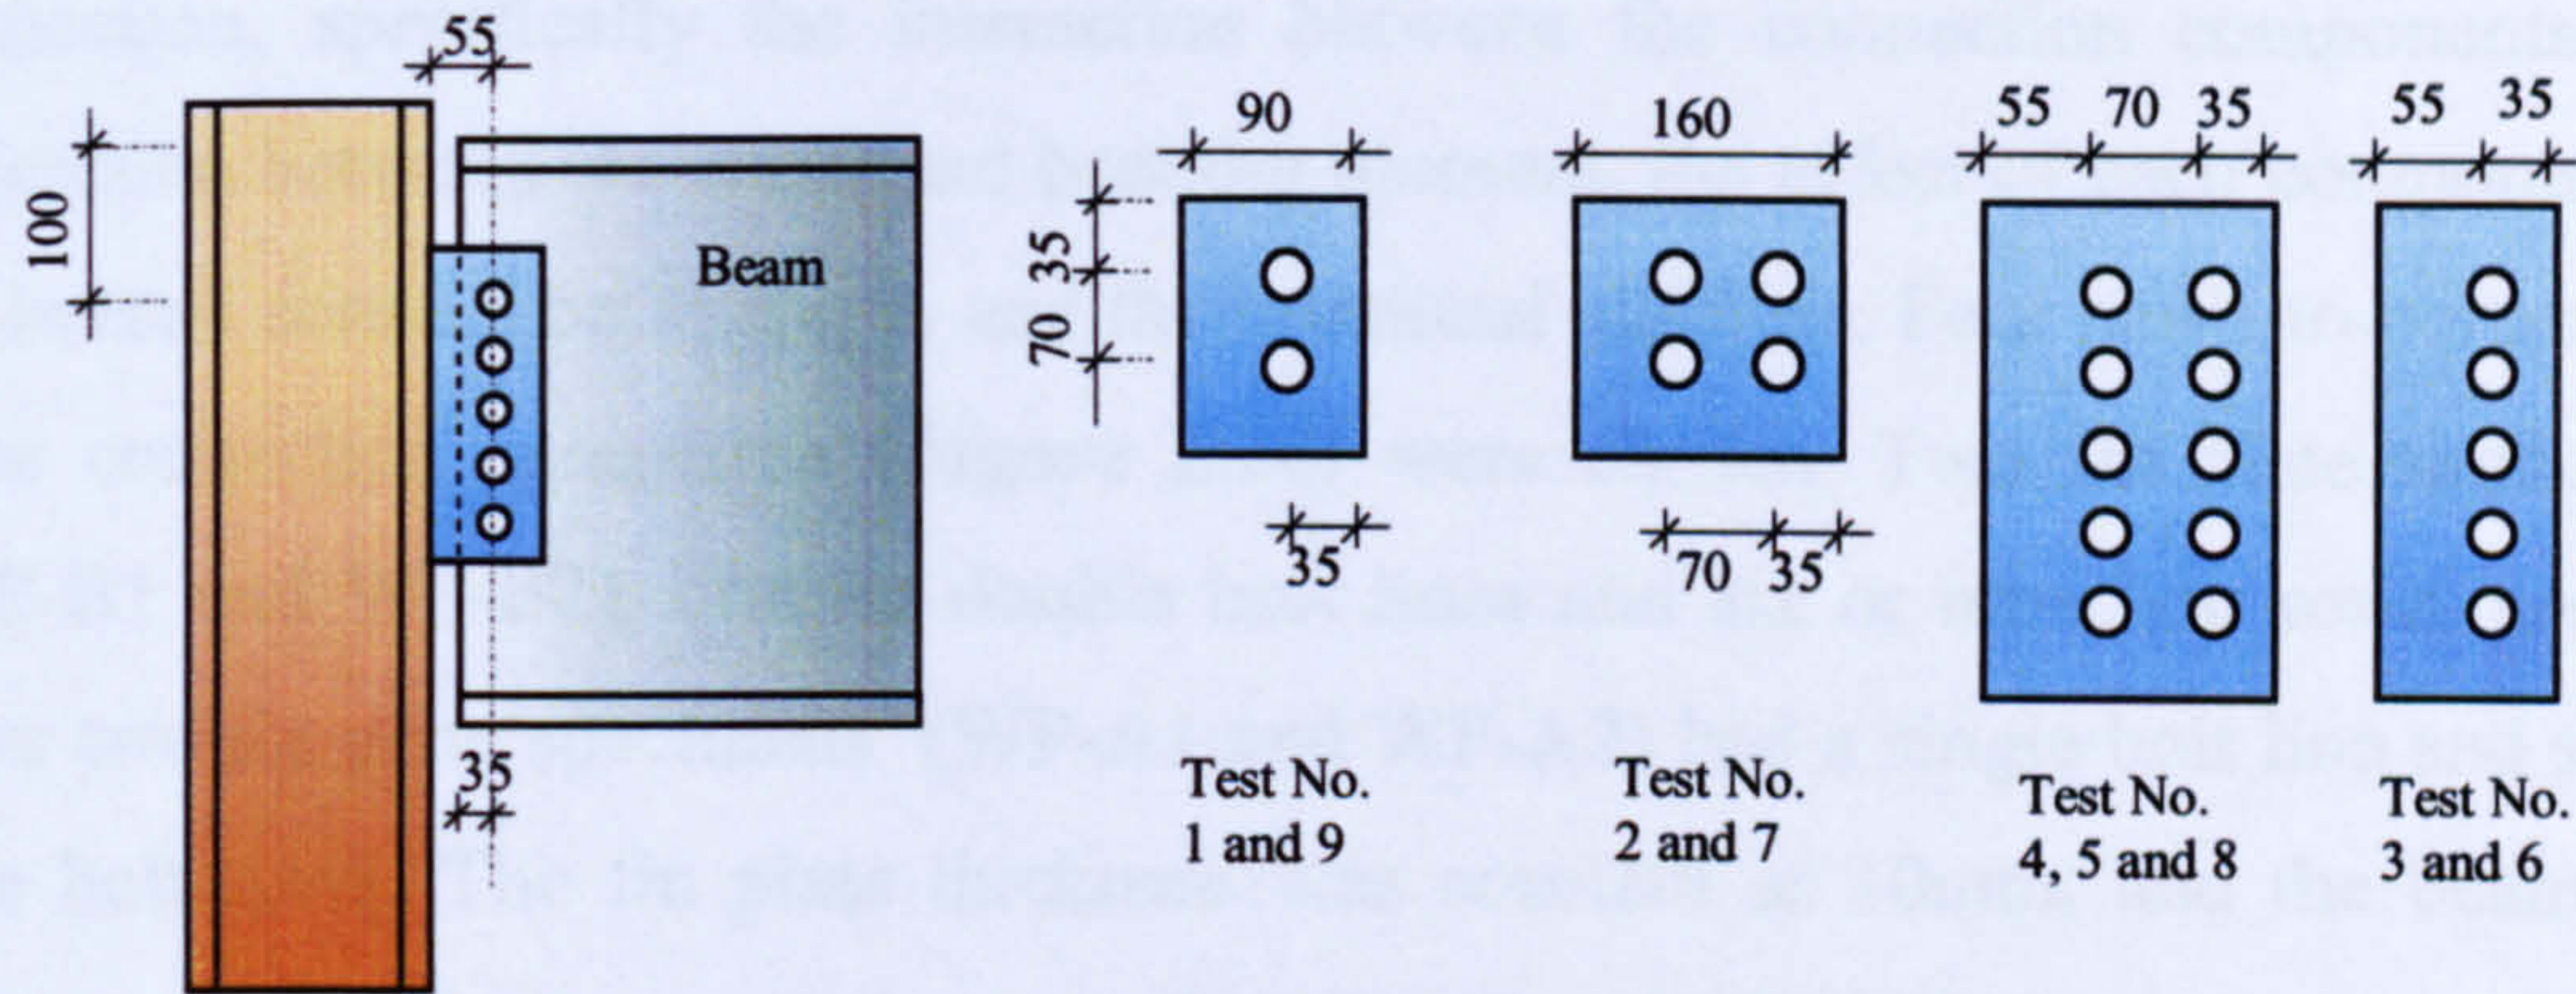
Geometric details of Pham *et. al.* tests specimens
